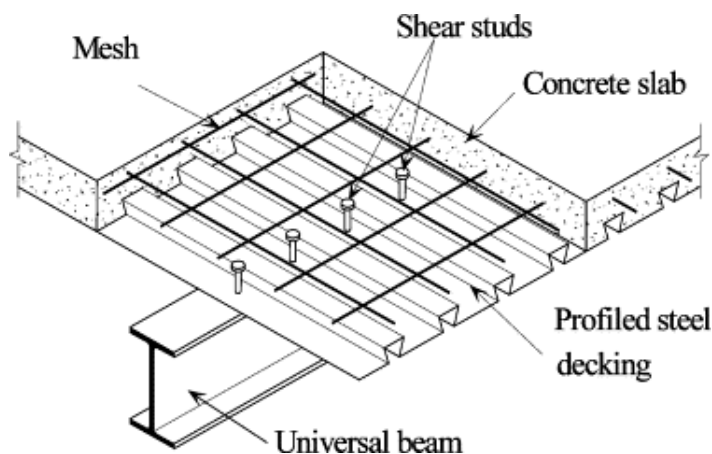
Steel-concrete composite floor slab and its components [3].
